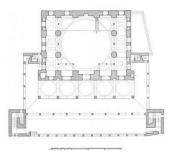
Rustem Pasha Mosque Ground Floor Plan (Ülgen, 1989)
